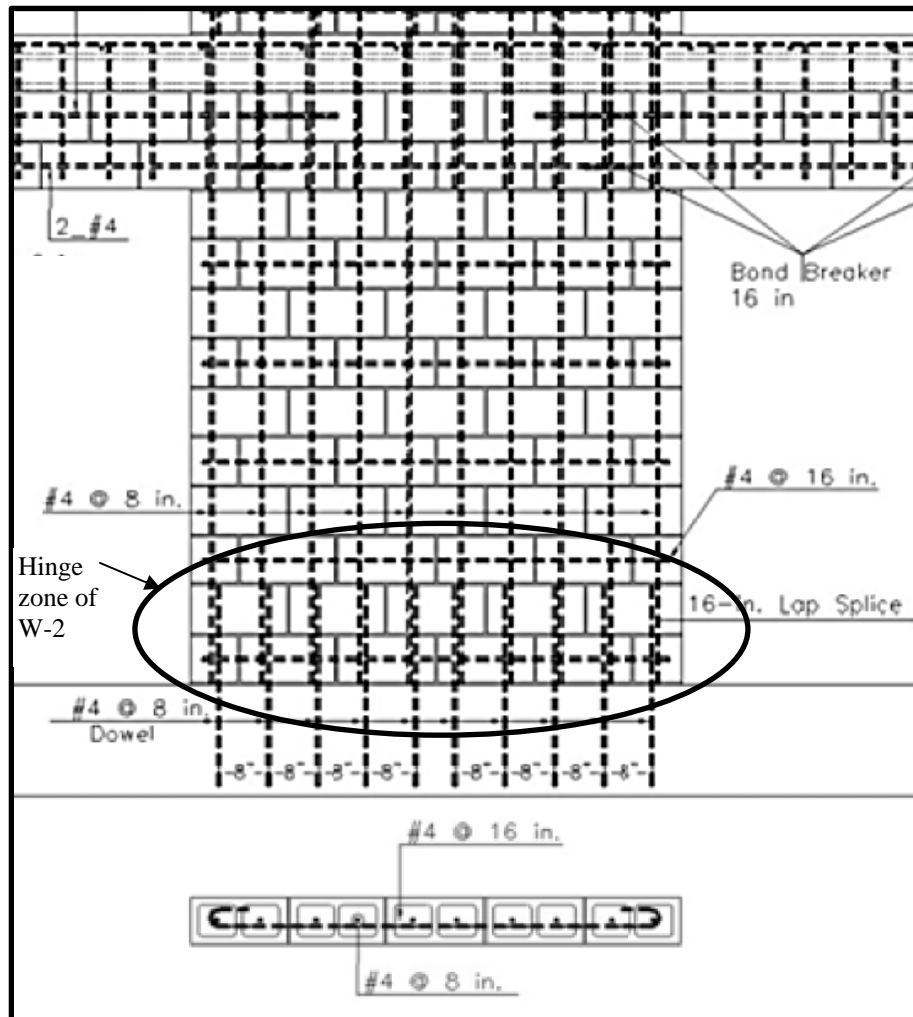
Internal reinforcement of W-2 and location of hinge zone (Stavridis, 2011)
